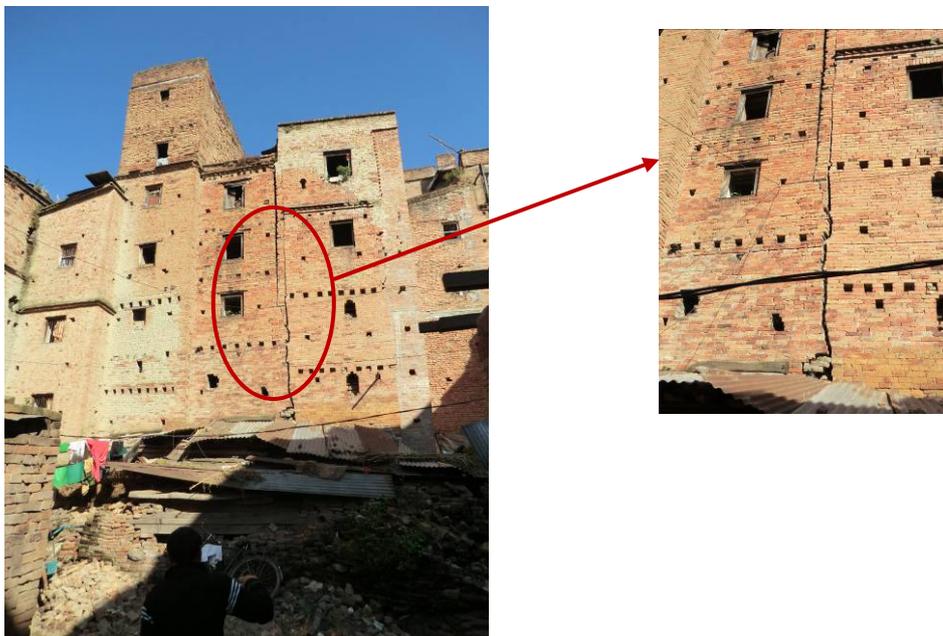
Buildings with vertical cracks on wall along the mortar joint at the common face between two adjacent buildings. The figure also depicts several buildings in a block with shared common walls. Construction material is brick with mud mortar, while the structural system is partial-load bearing.
